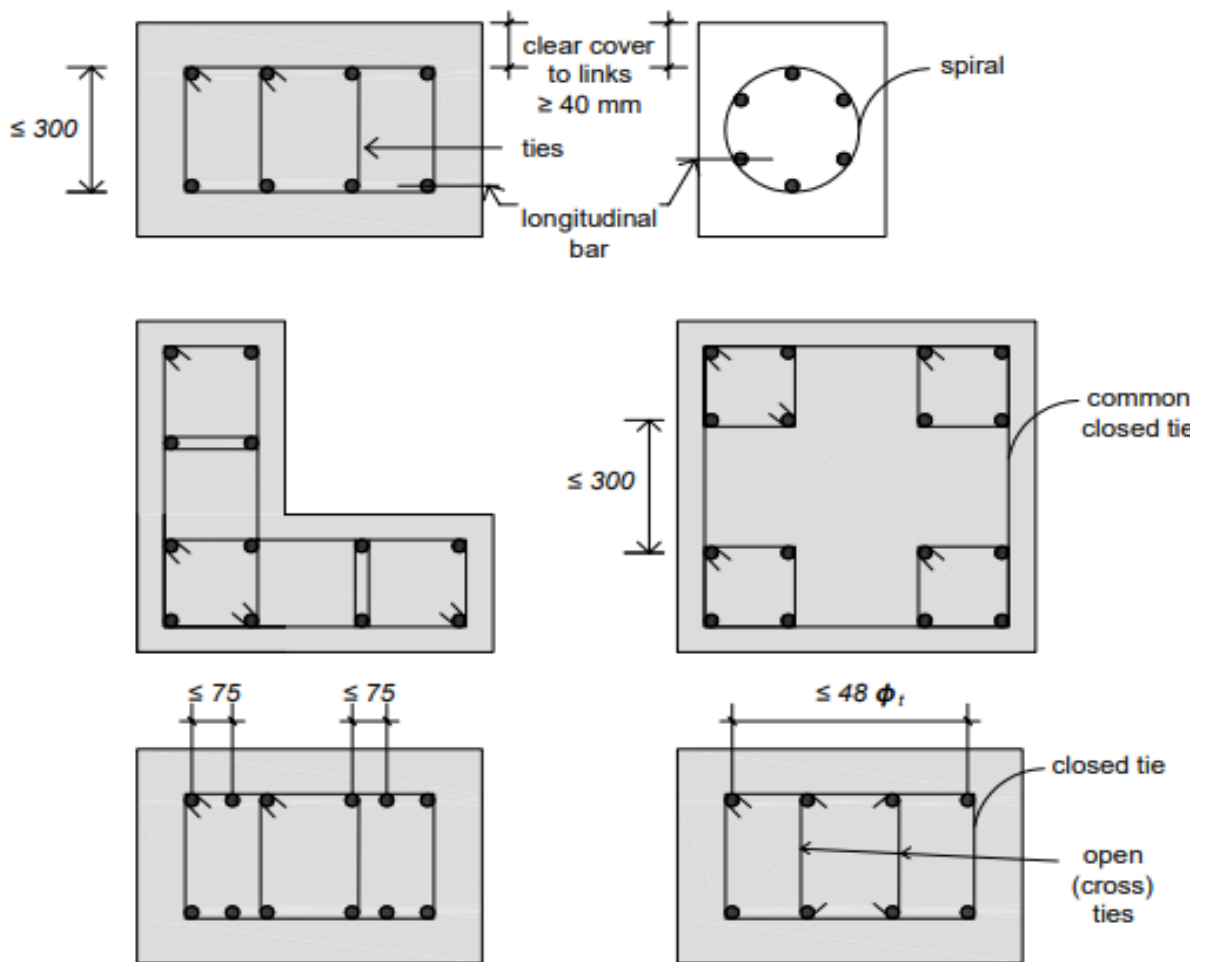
IS 456-2000 recommendations for reinforcement detailing in column
